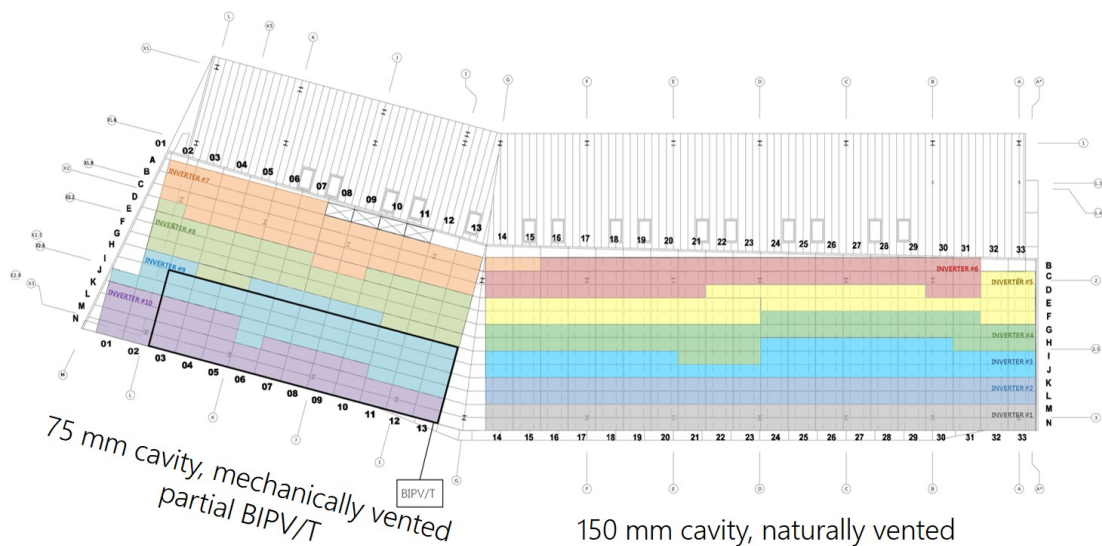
BIPV/T roof showing panels connected to inverters identified by colour.
